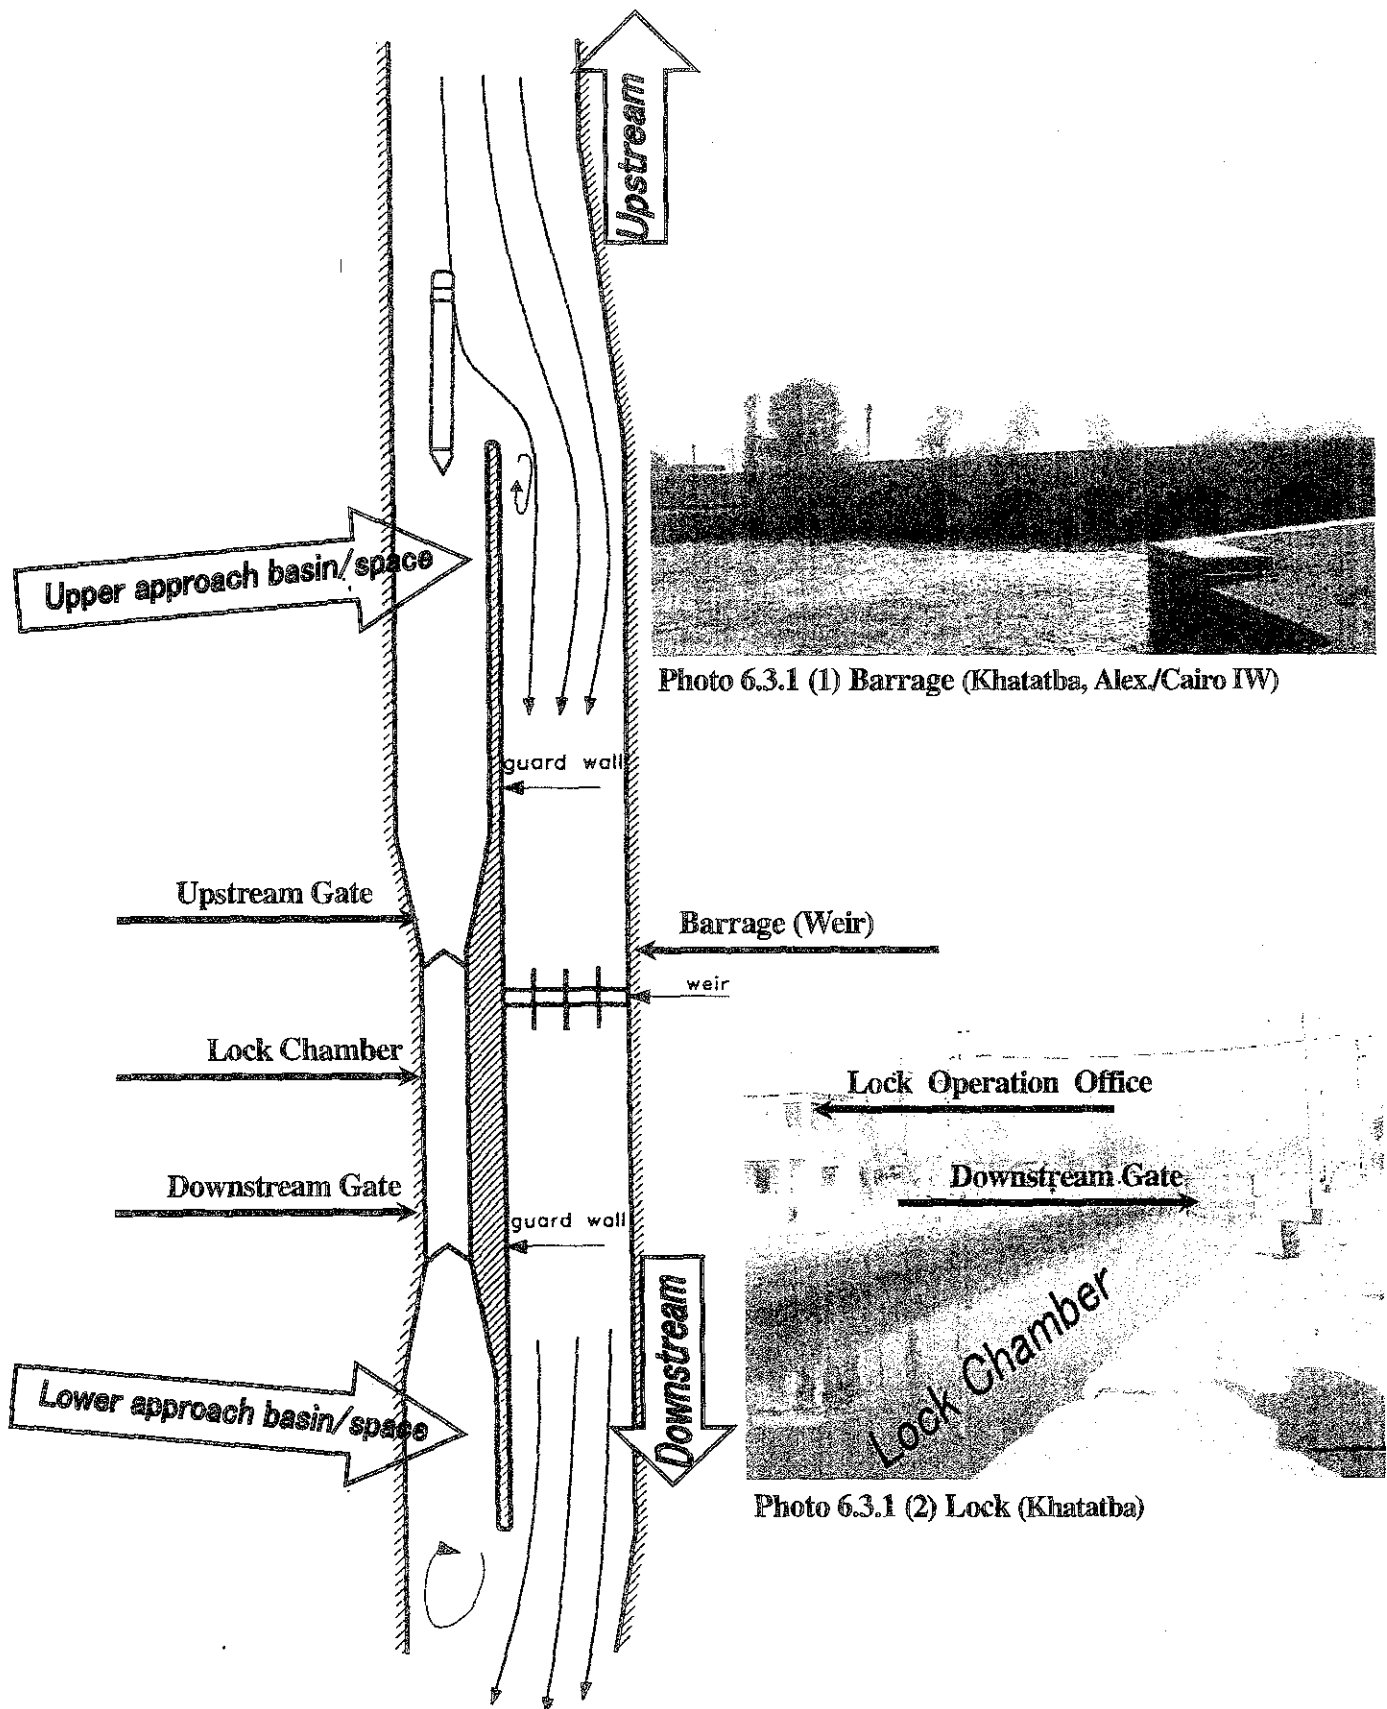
Typical Layout Plan of a Navigation Lock and a Barrage
